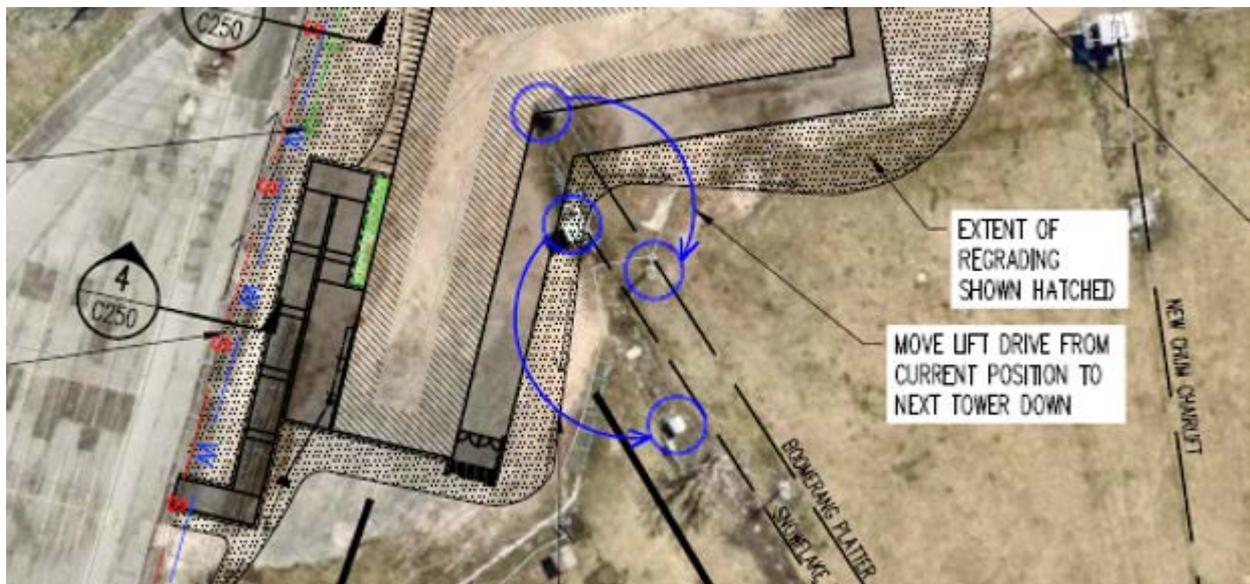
| Lifting facilities site plan (Source: Applicant's documentation)
